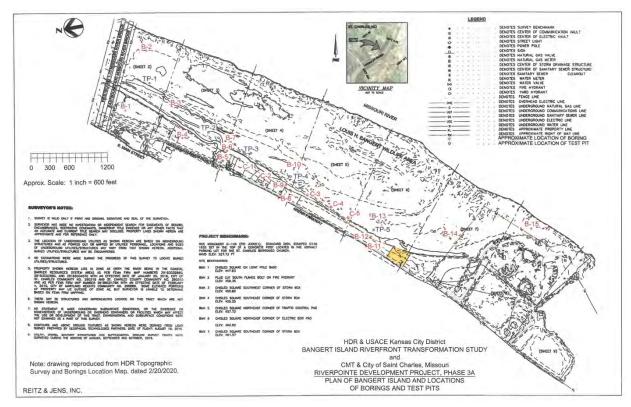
Plan map showing locations of borings (B- and C-) and test pits (TP-).
